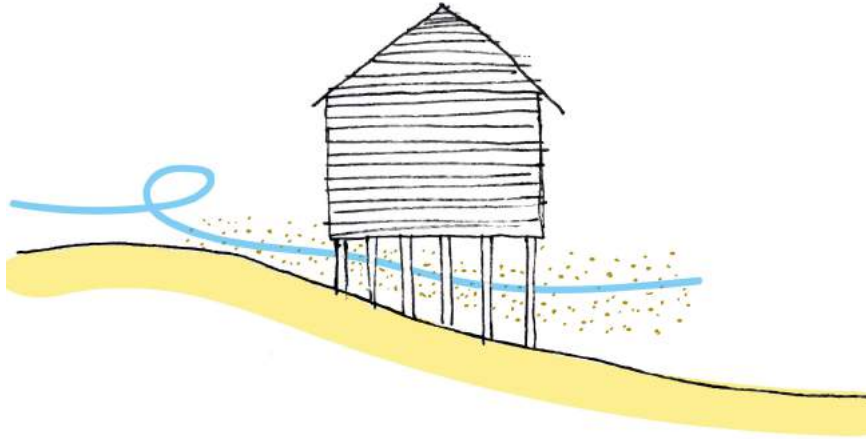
Wind blowing beneath the palafitic timber building.
